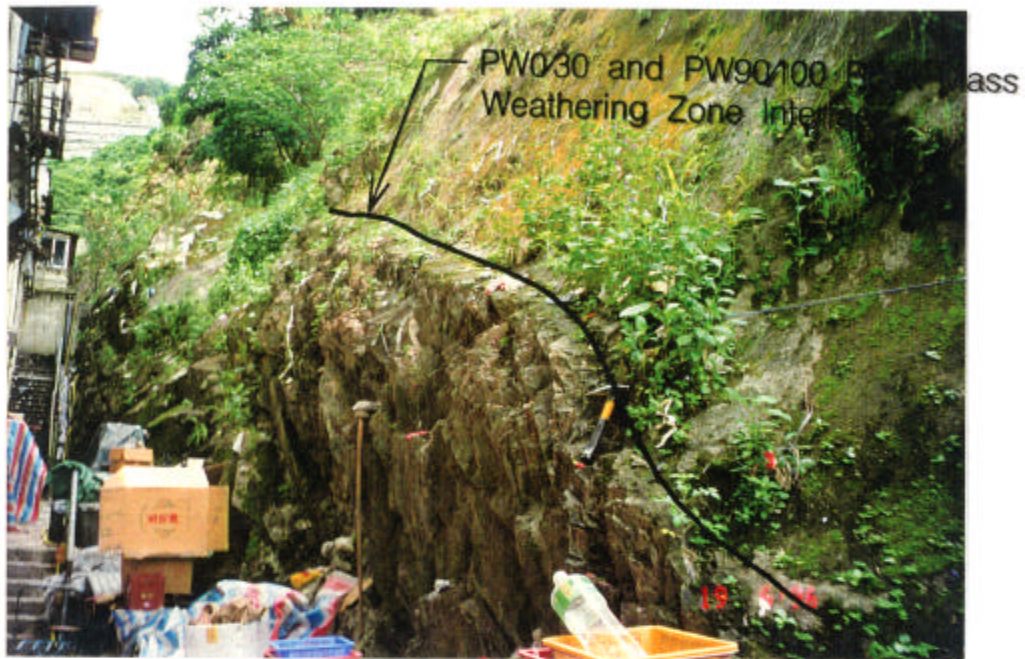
Planar Interface in Tuff, Separating the PW90/100 and PW0/30 Zones, Looking South at Slope 11SE-D/C14, South of Fei Tsui Road (Taken 5/7/96)
